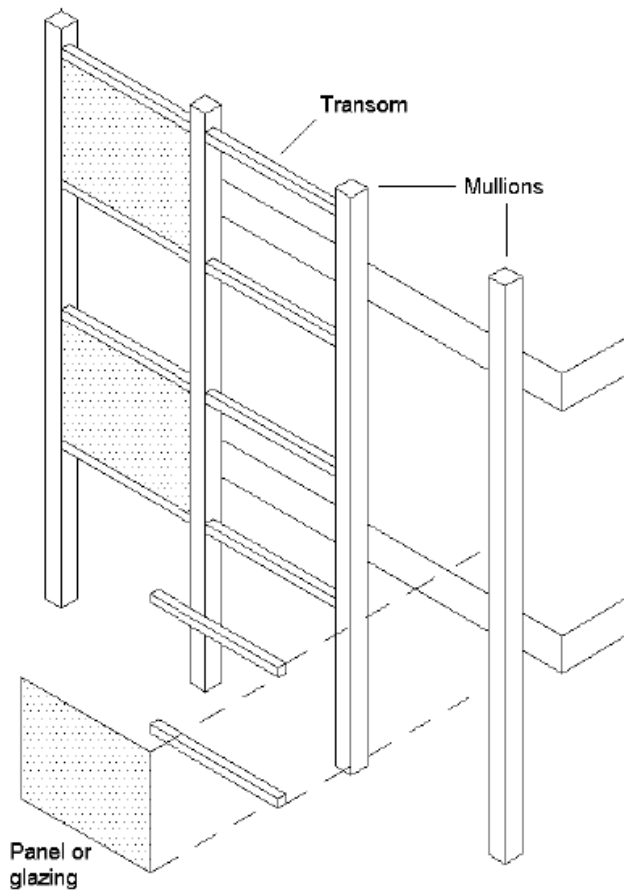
Stick system curtain walling: schematic drawing (Umberto GALLI, 2011)
